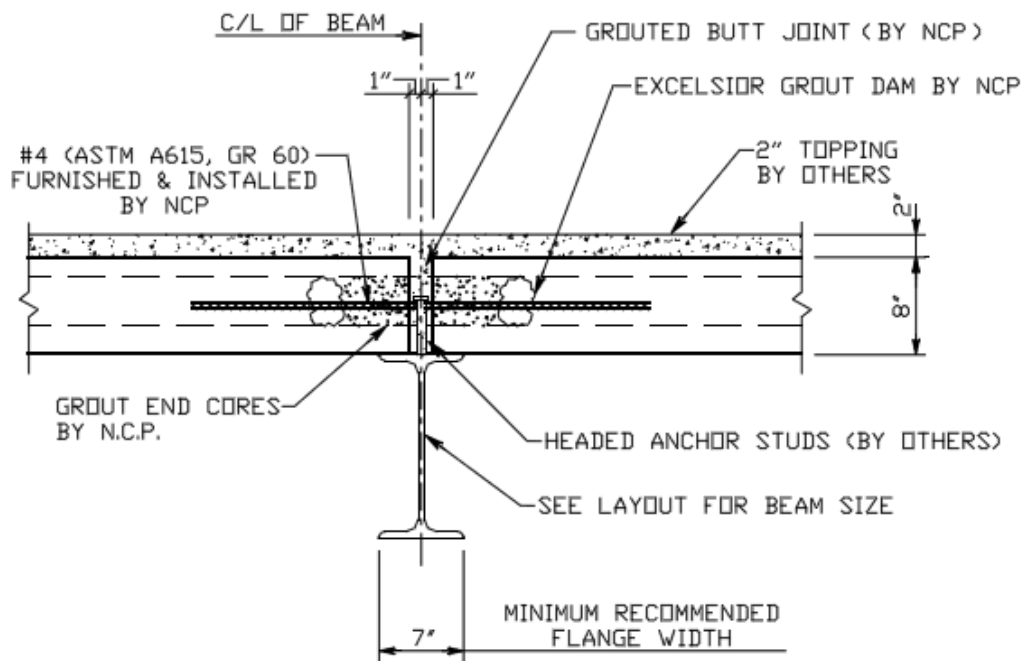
THIS FIGURE SHOWS A HOLLOW CORE PLANK CONNECTION BEARING ON A STEEL BEAM. DETAIL COURTESY OF NITTERHOUSE CONCRETE PRODUCTS
